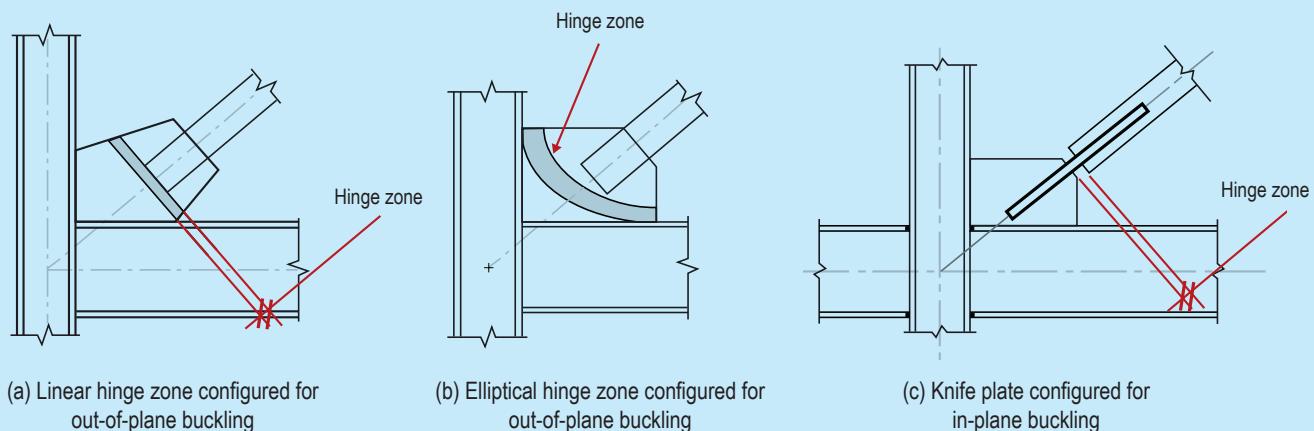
Details configured to provide brace buckling rotation capacity.
